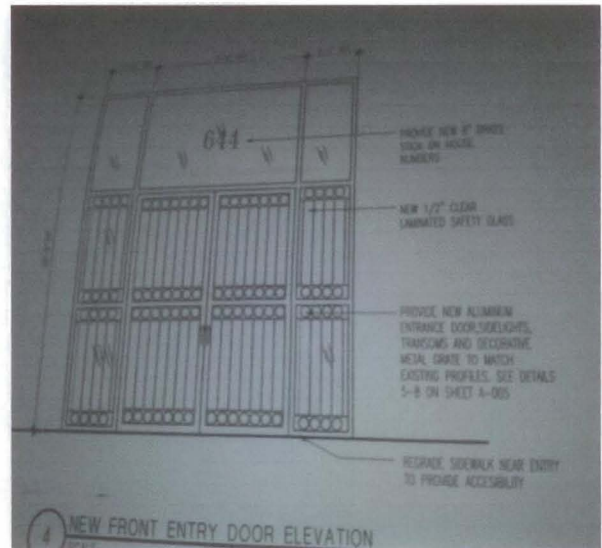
of 2 – Inadequacies – Plans Front Entrance
